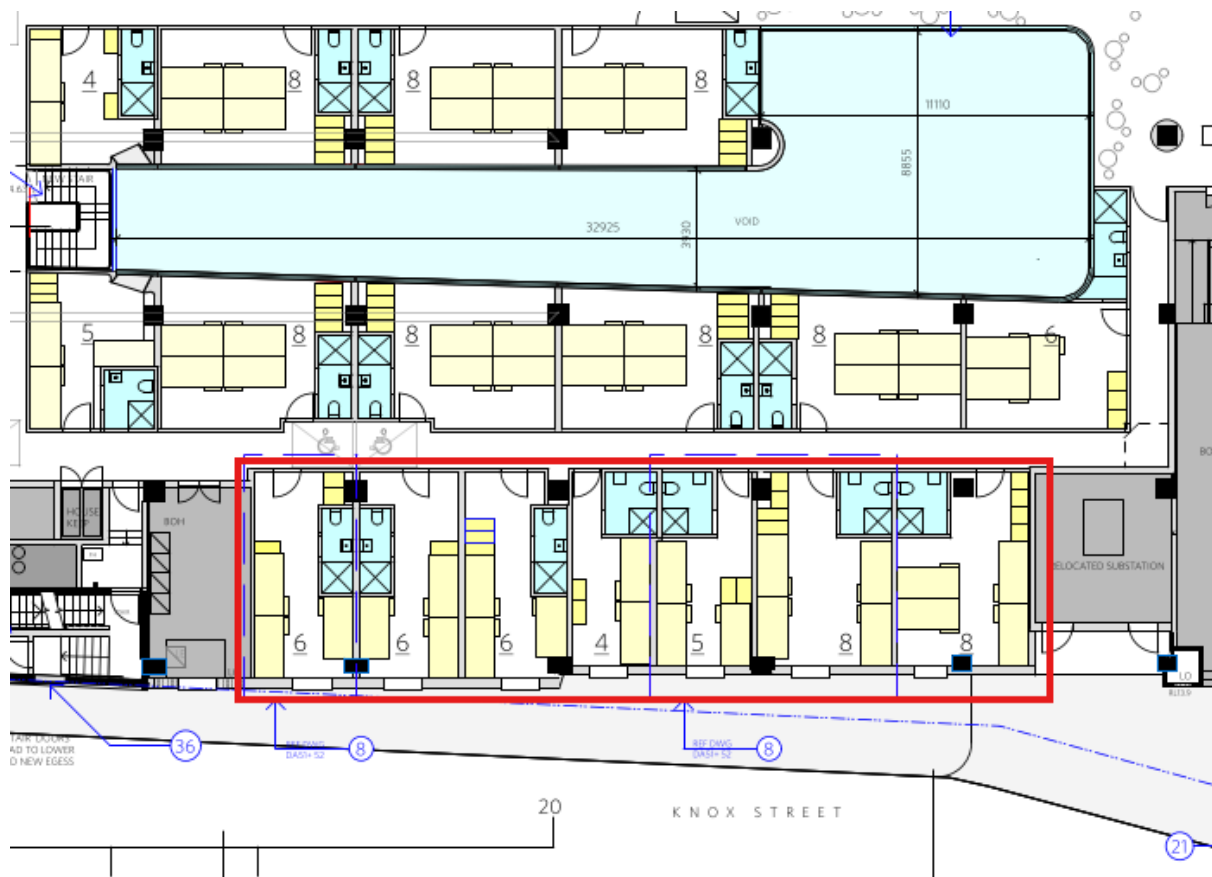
Architectural plans highlighting subject dormitory rooms on level 1
